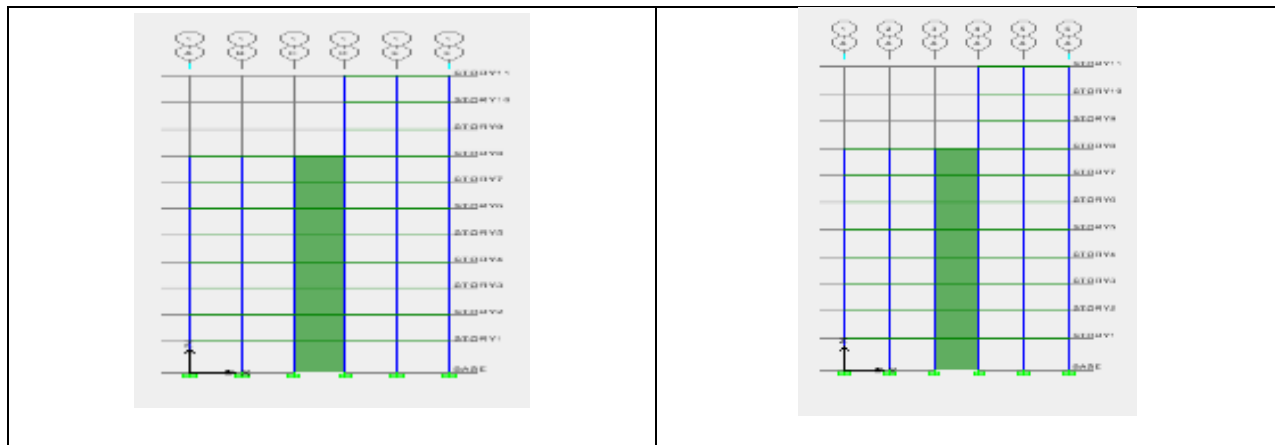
Elevation of Asymmetric building Model-3 along longitudinal and transverse direction
